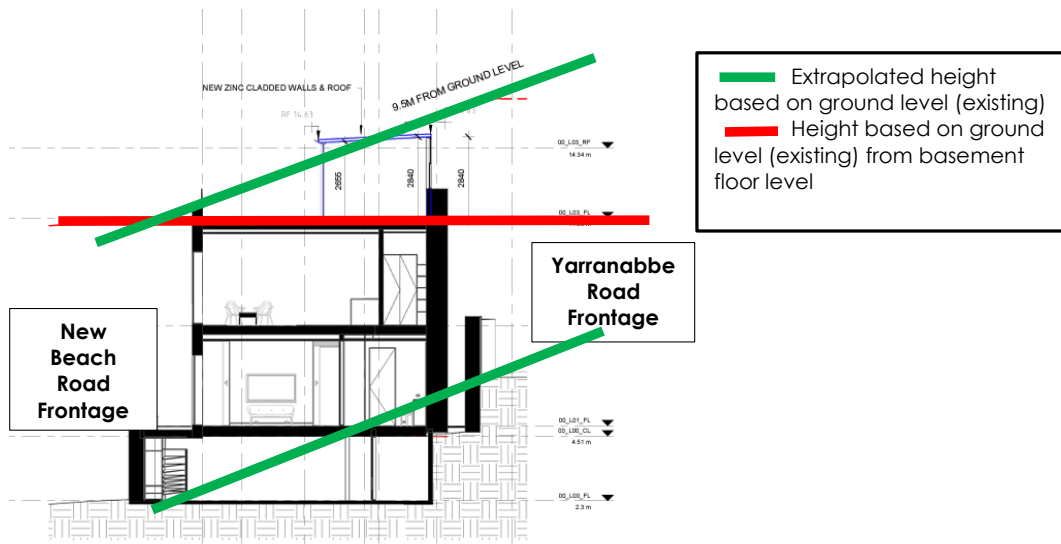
Section identifying the height plane where the basement floor level is used (Source: Dreamscapes Architects, 2022)
